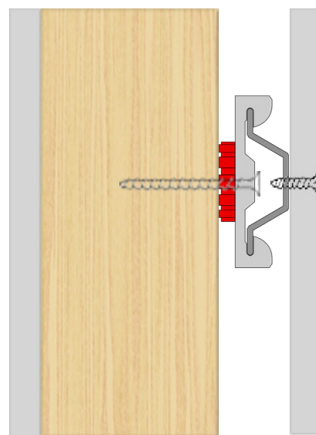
Install clips to the building frame and install the drywall directly to the channel. Drywall screws should not be in line with the clip screws.
